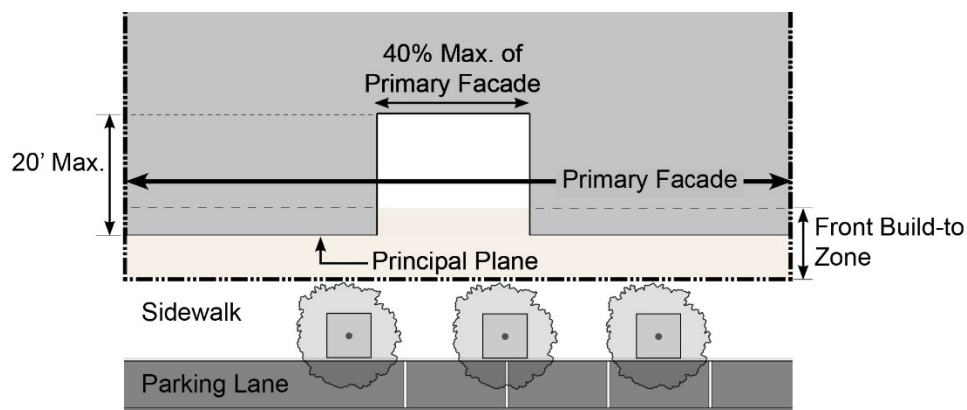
e.1.v: Frontage Occupancy: Primary Facade and Permitted Forecourts (outside of the Downtown Historic Overlay)
